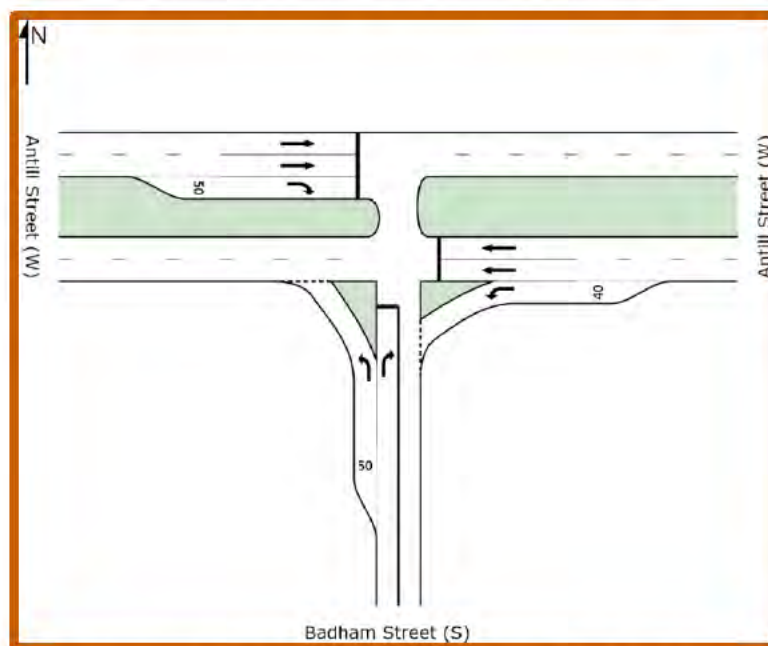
Recommended Layout for the Intersection of Antill Street and Badham Street
